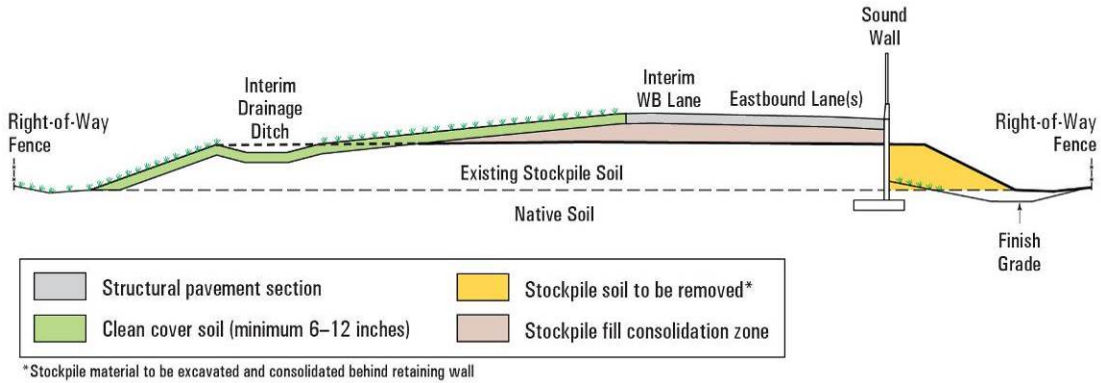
Phase 1 - Typical Stockpile Cross-Section
